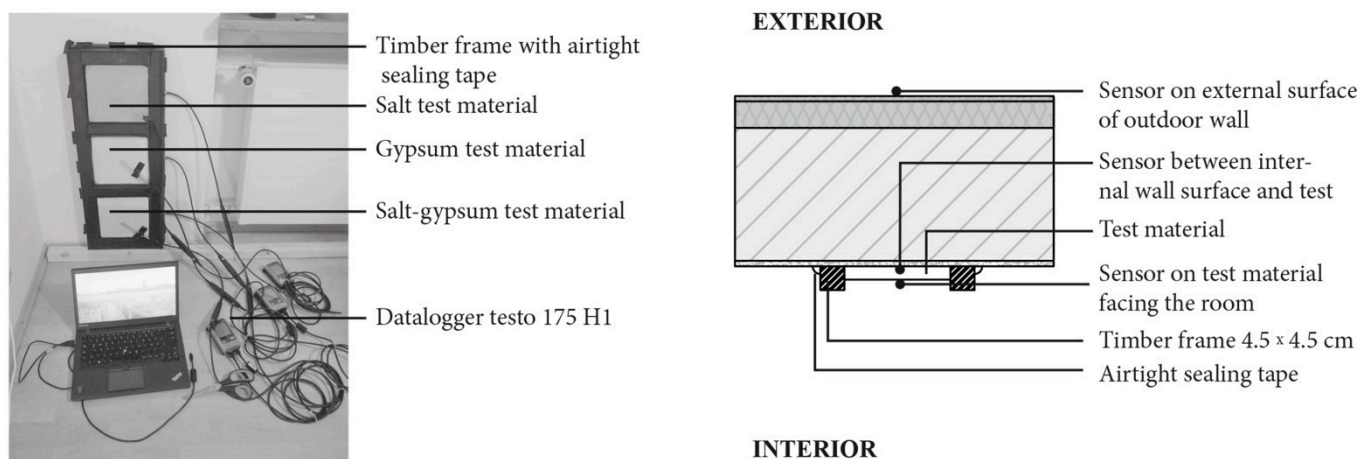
(Left): Test panel. (Right): Horizontal section through the test panel installation.
